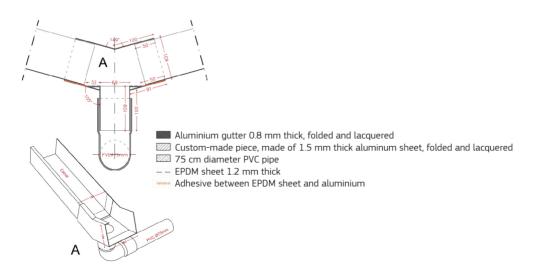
URBAN GreenUP Project: Green Façade construction details (© SingularGreen).
